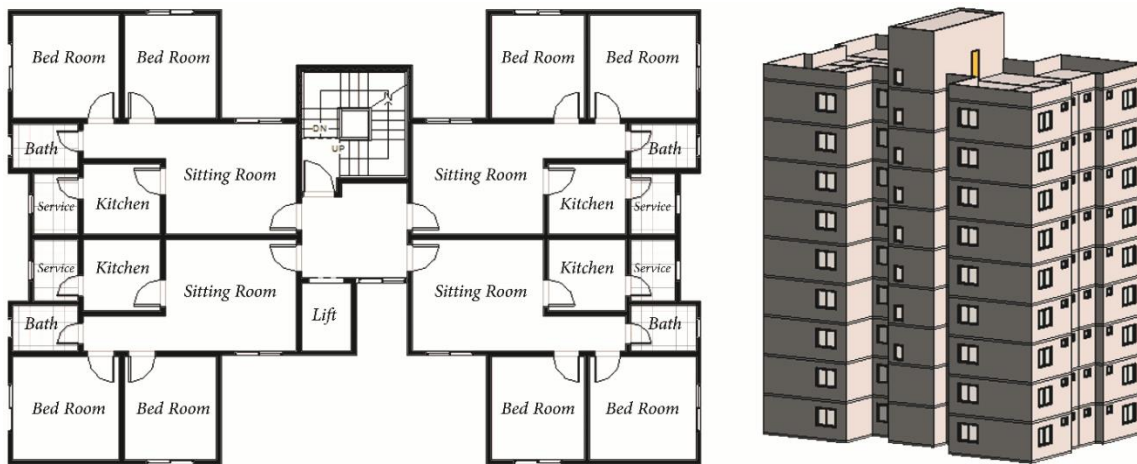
2D plan and 3D modelling of the multi-story residential building
